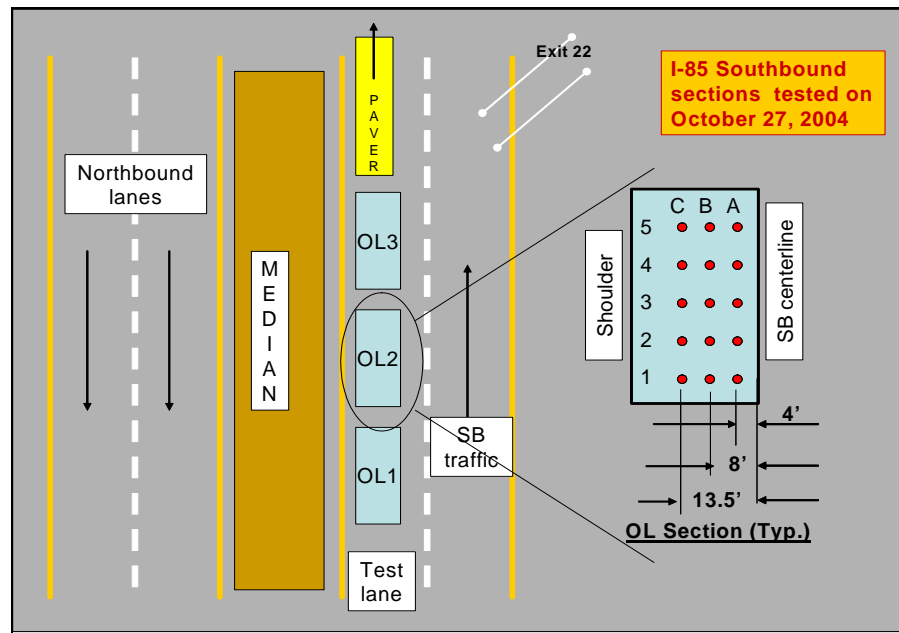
Section Layout for Nondestructive Testing Along the I-85 Overlay Project, West of Auburn, Alabama
